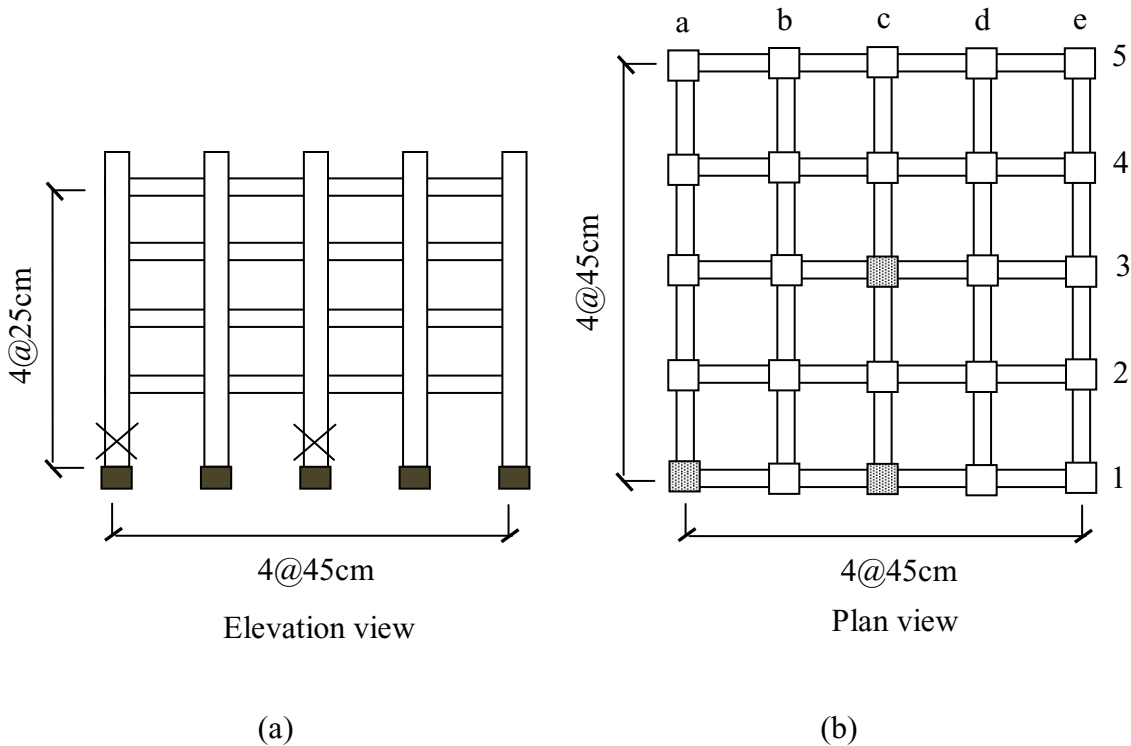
Building configurations (a) elevation view and (b) plan view
